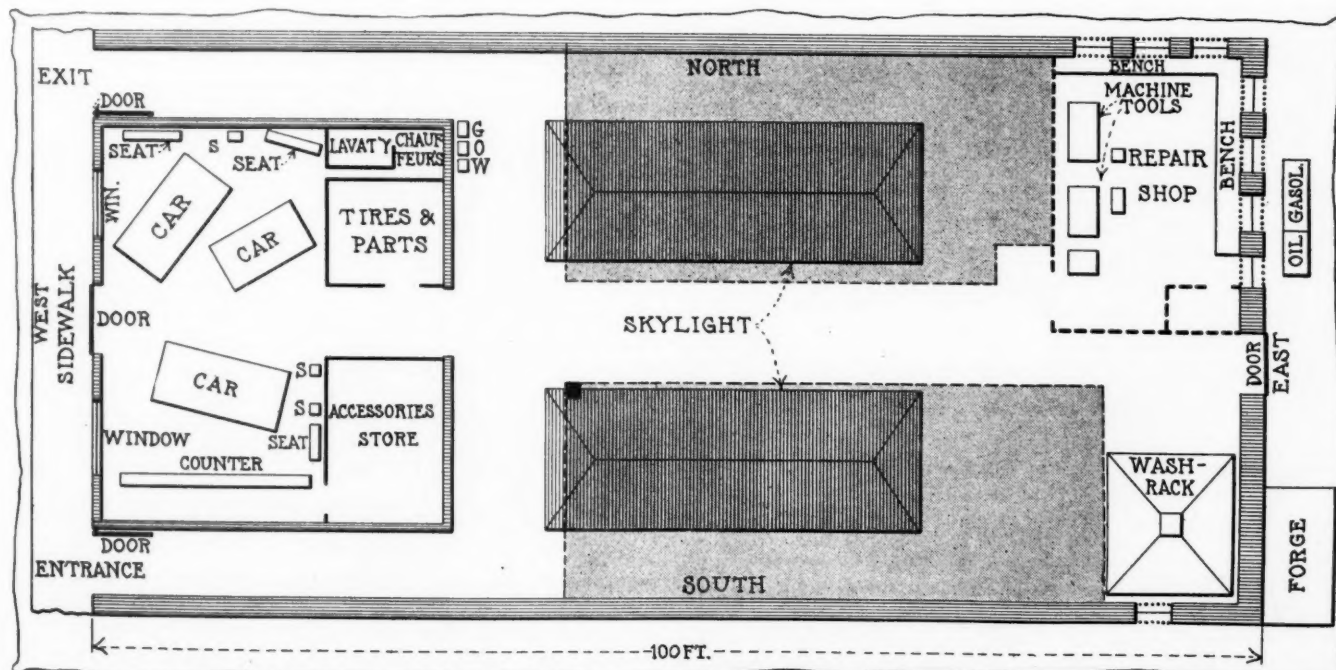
Plan view of floor of suggested garage for storage store and repair purposes having 100 foot length
